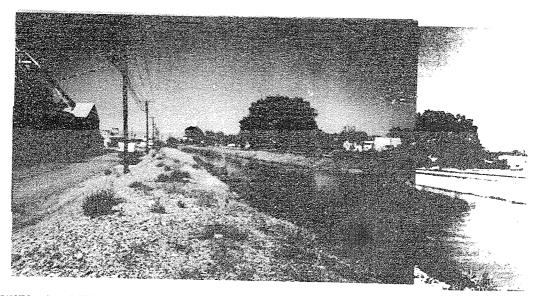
DIRT EMBANKMENT SEPARATING WAREHOUSE AND GARLAND CANAL, LOOKING SOUTHWEST.
